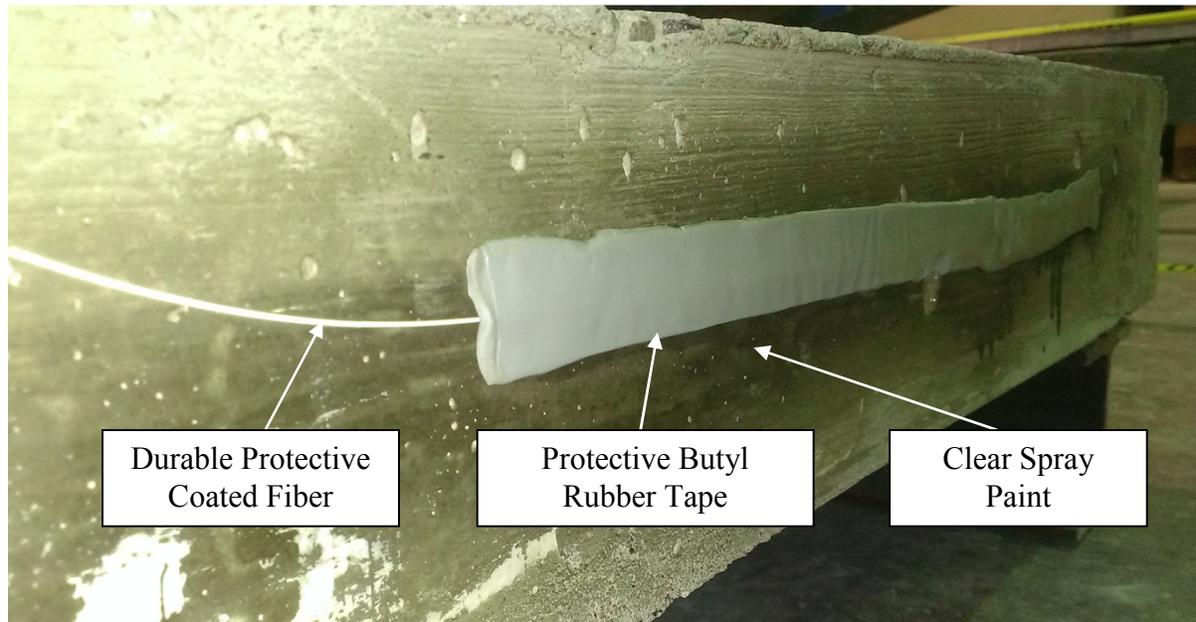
Protection Method 2 for Fibers Installed on Concrete
